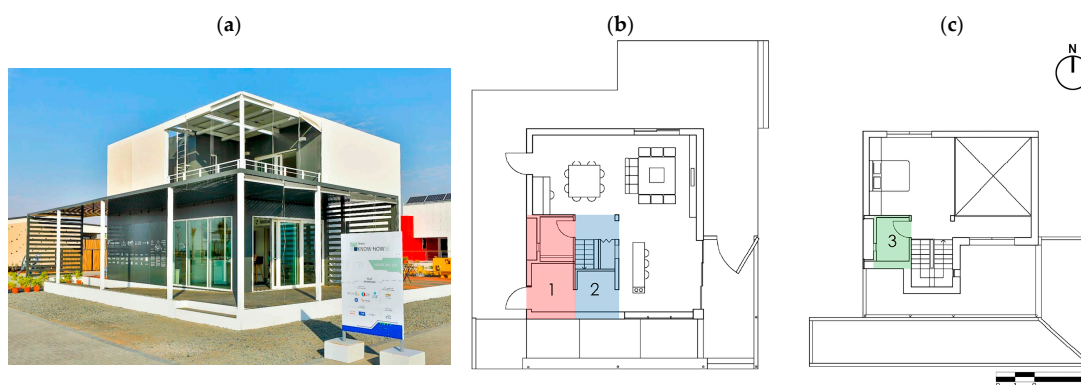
Team KNOW HOWse project. (a) Exterior view (b) Ground floor plan—1: bathroom, utility room, kitchen (first part); 2: stairs, kitchen (second part). (c) First-floor plan—3: bathroom. (Photo: SDME 2018 Organization. Floor plans: by authors based on team KNOW HOWse drawings).
